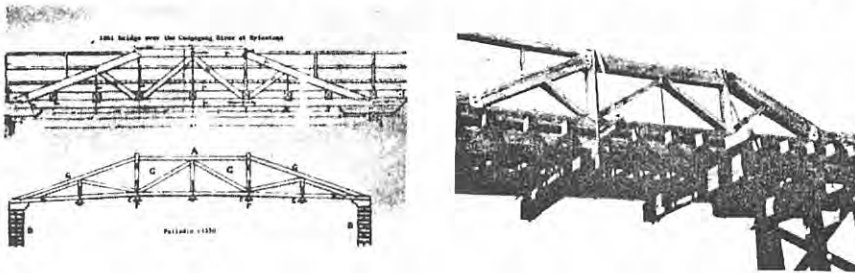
The first timber trusses, both for road and rail, were modelled on one of Palladio's trusses. A survivor of that style spans Umeralla Creek on the Cooma Line.
